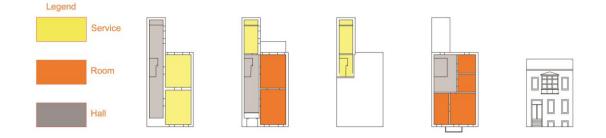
The base sample of the two-story İzmir Houses with plan type 3
